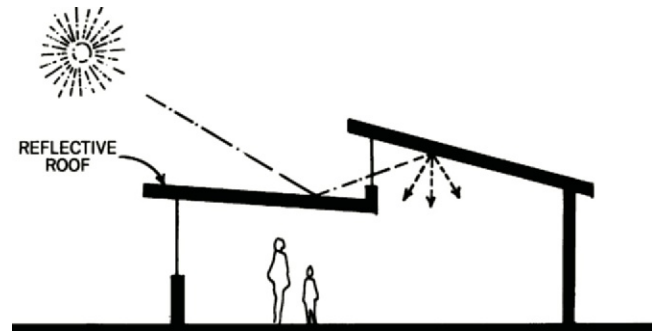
Use a very reflective roof to maximize the diffused light entering the building.
